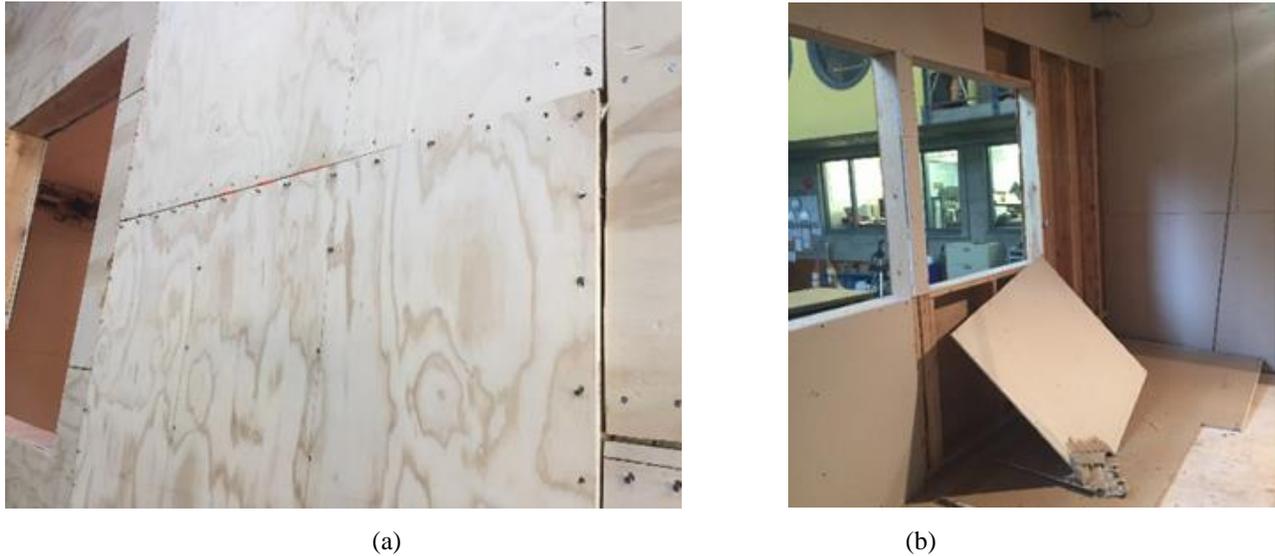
Damage in Specimen Sp-1 after test #3: a) southwest shear wall, b) internal view of gypsum wall boards.
